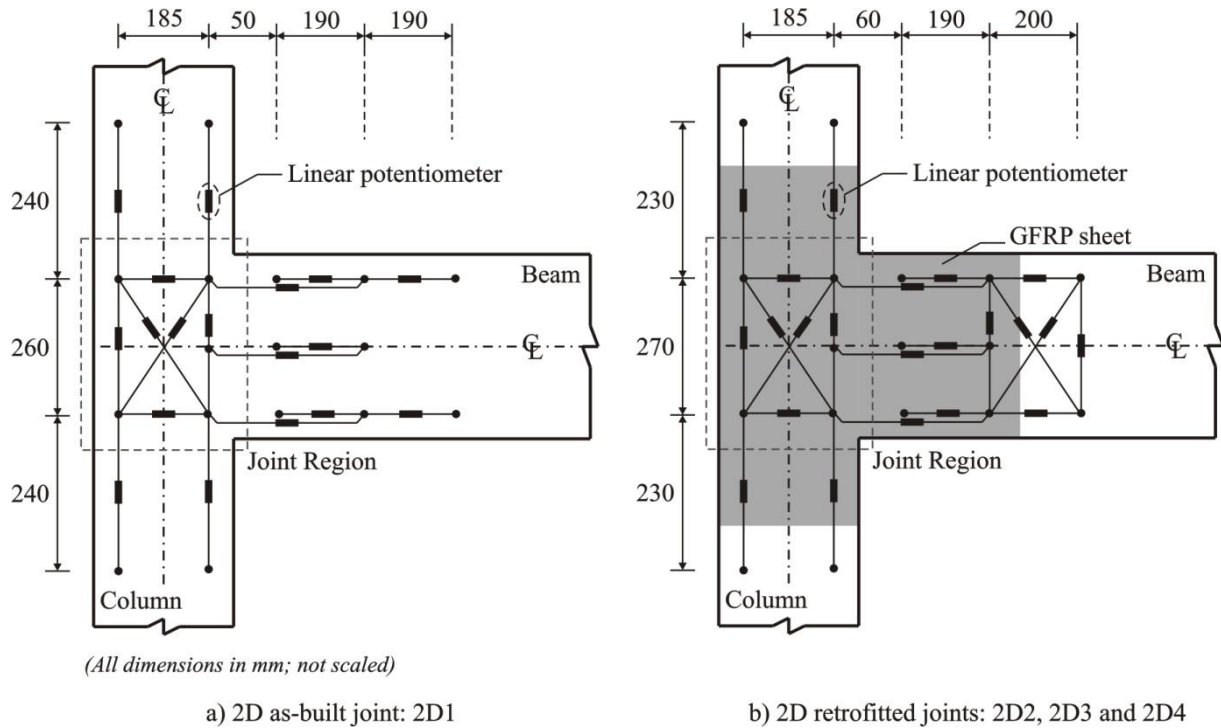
Local instrumentation for 2D as-built and retrofitted beam-column joints
